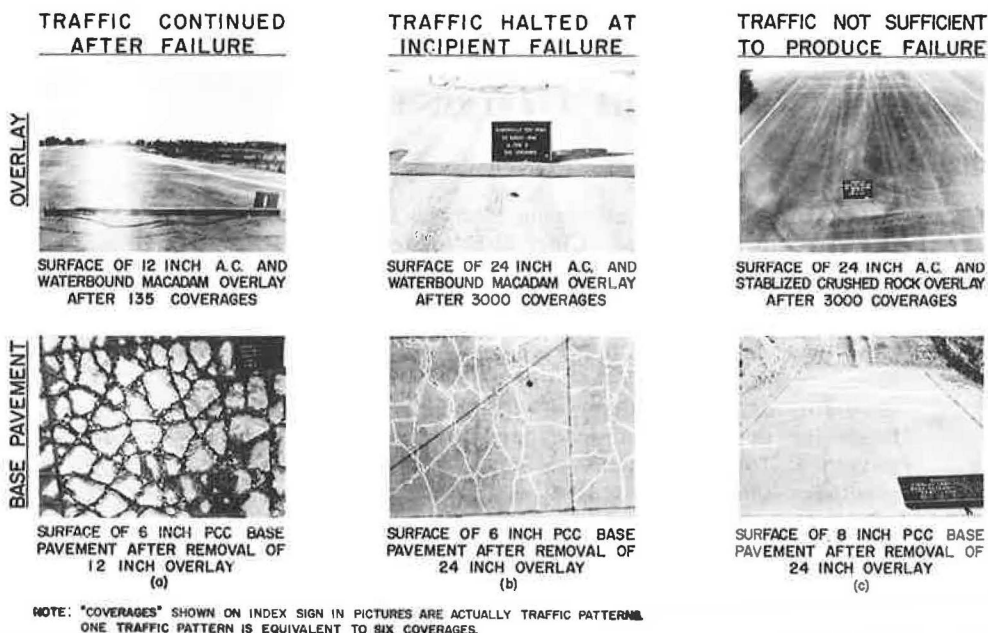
Typical after traffic overlay and base pavement conditions, Sharonville overlay test tracks.
